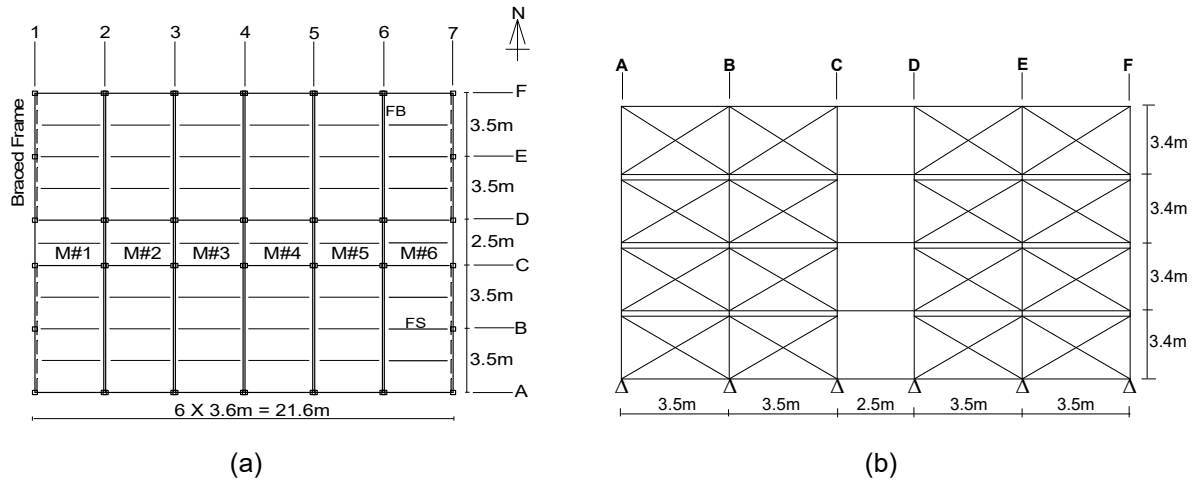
4-storey modular steel braced frame (a) Floor plan (b) Elevation (centerline 1 or 7)
